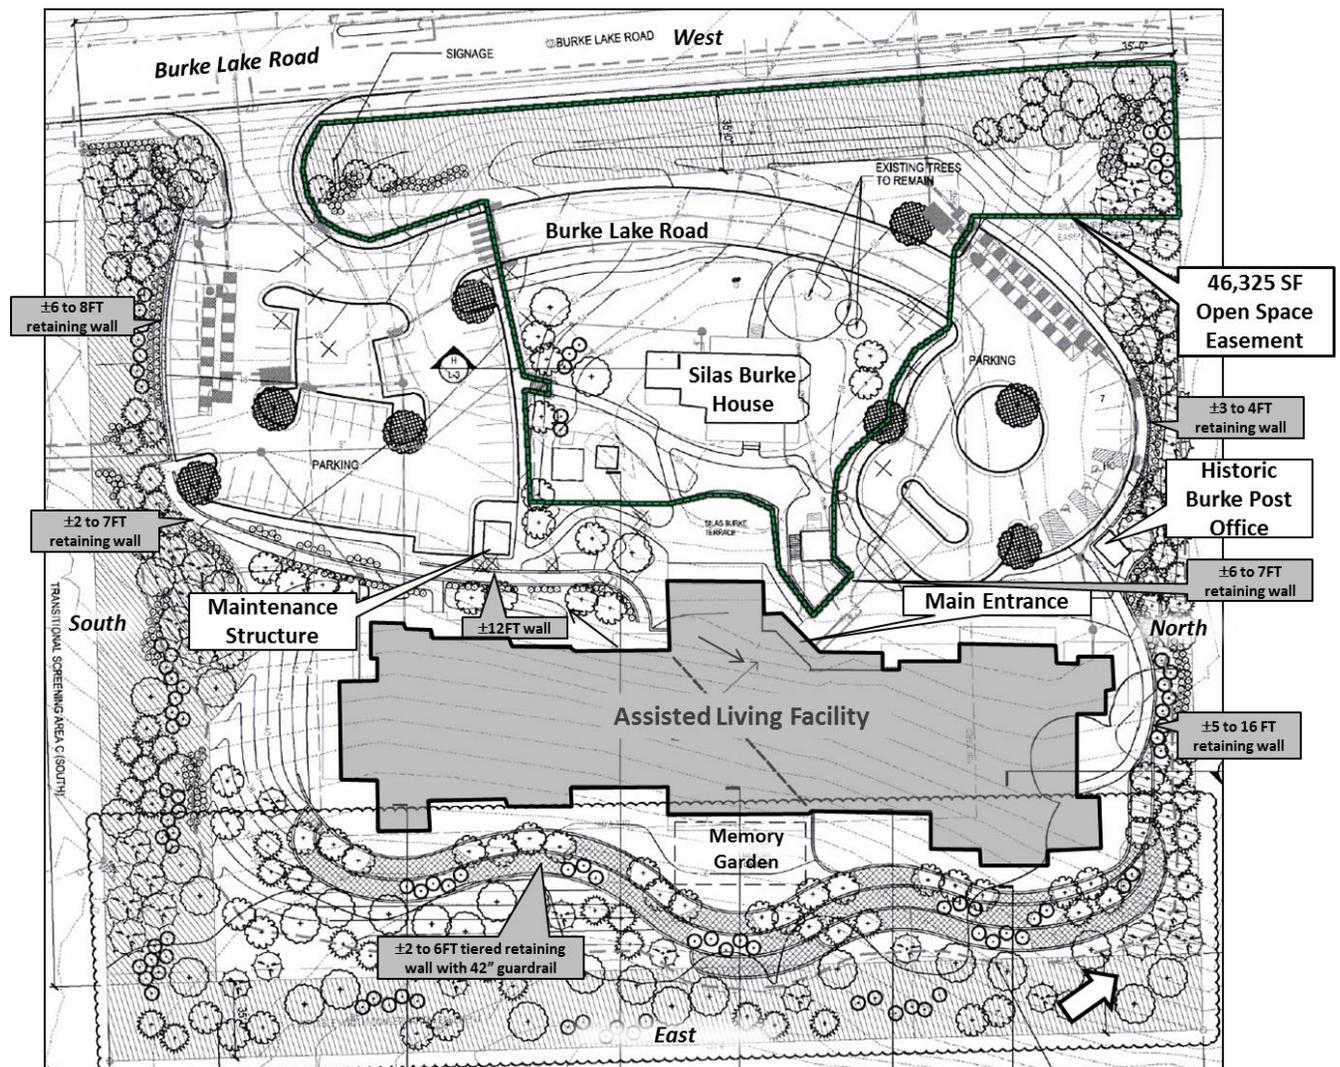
Site Layout, Source: GDP/SE Plat, Sheet C-7
